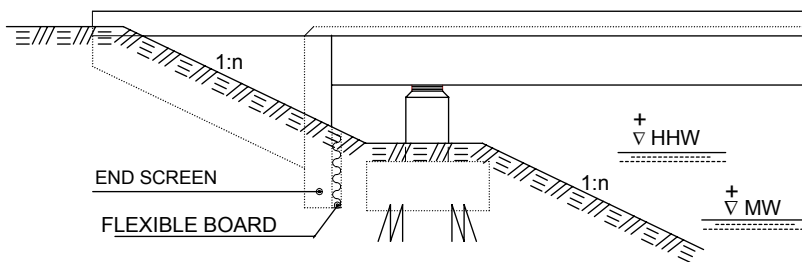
Swedish jointless bridge with bearings and high-built foundation on piles (Vägverket 1996).
